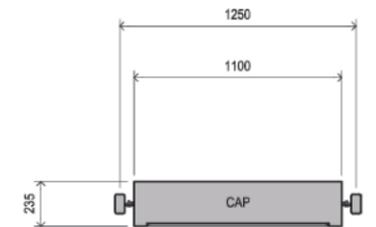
Typical Customer Assistance Panel (CAP) Detail Plan
